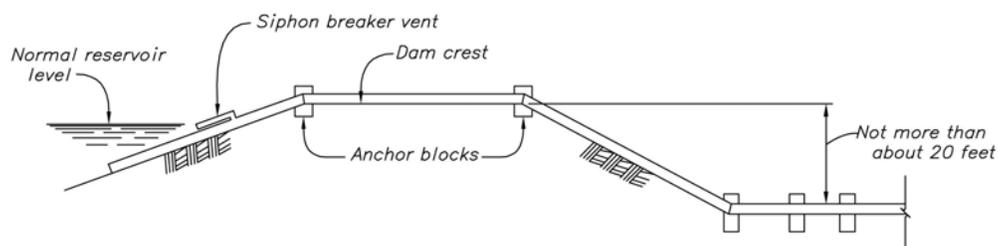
A simple siphon constructed over the crest of an embankment dam.
